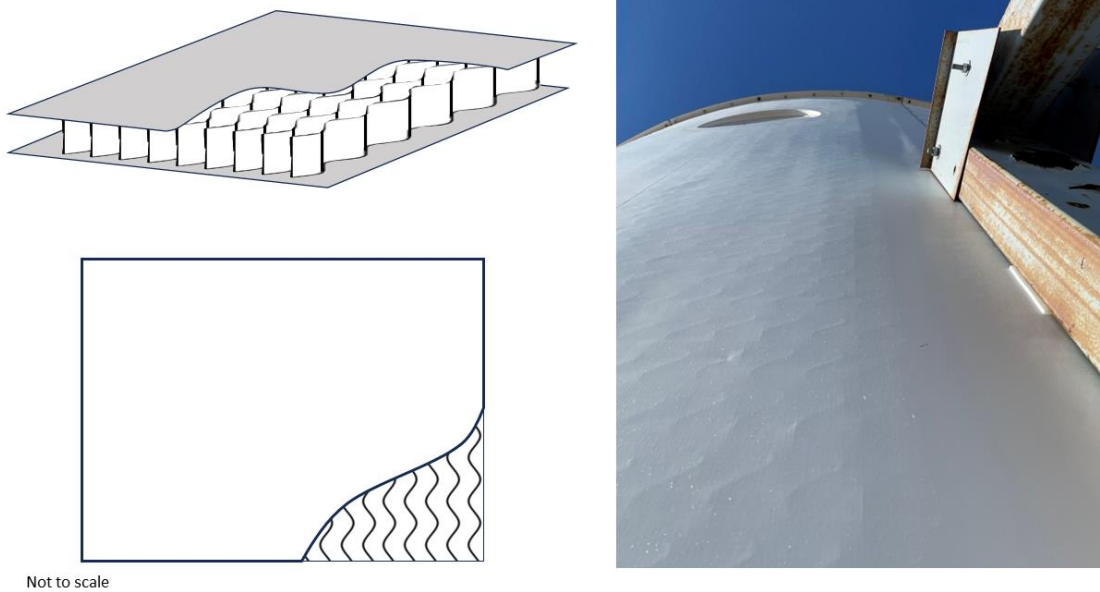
Illustration showing composite layup and core shape and orientation typical of the wall and roof panels (Left). A view at a low sun angle shows the corrugations through the exterior face sheet (Right).
